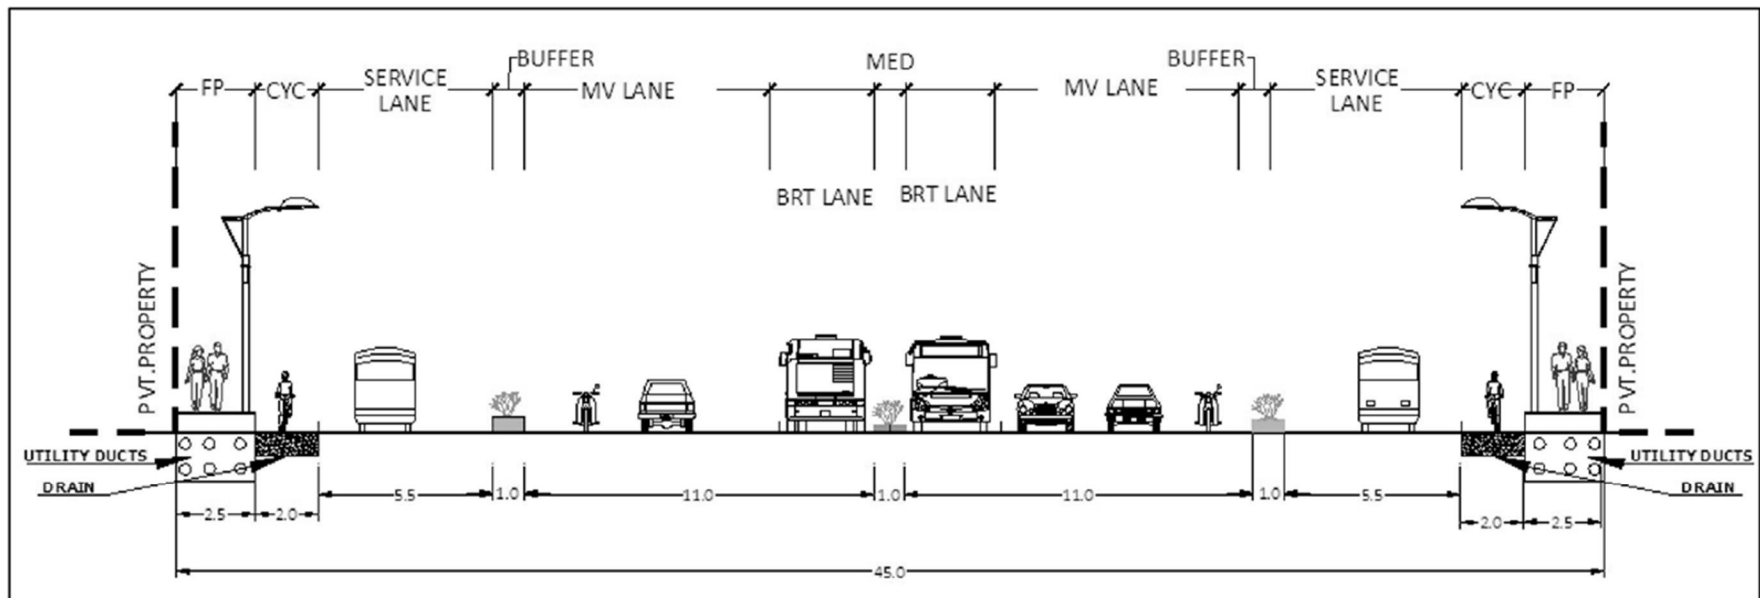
Cross-section of Arterial Road for ROW of 45 m
